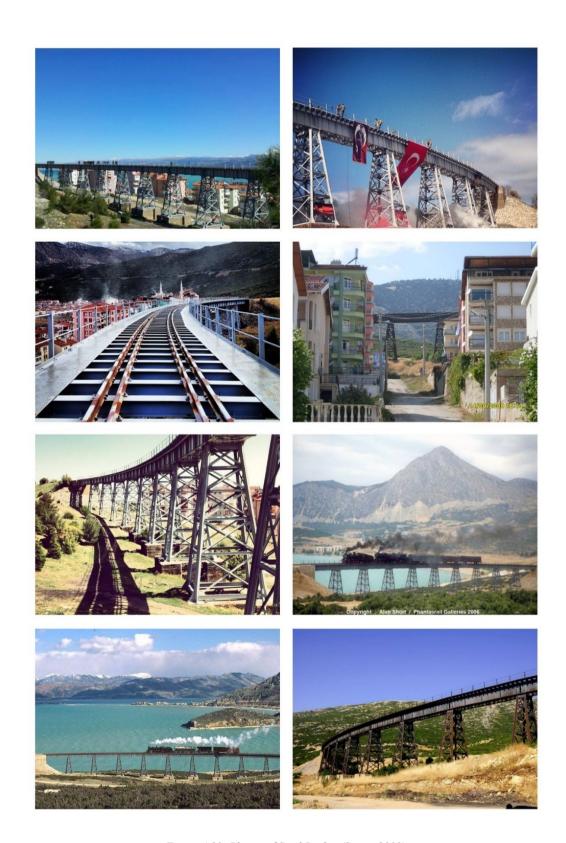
Photos of Steel Bridge (Sinan, 2019)
